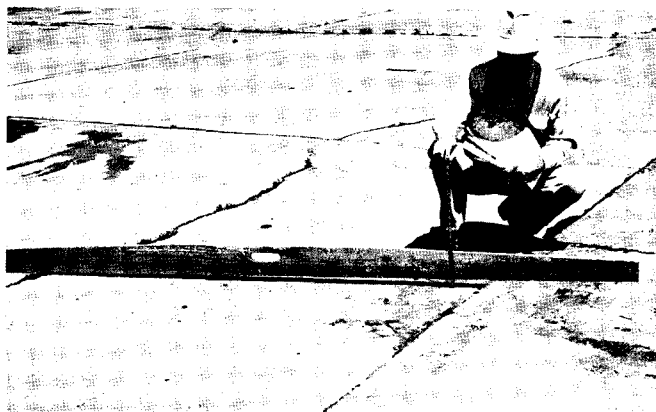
Faulting of portland cement concrete pavement (15).
